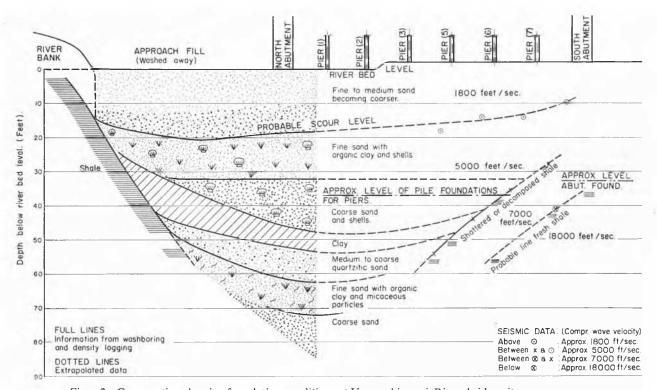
Cross section showing foundation conditions at Umpambinyoni River bridge site. Coupe en travers montrant les conditions de fondation au pont sur le fleuve Umpambinyoni.
